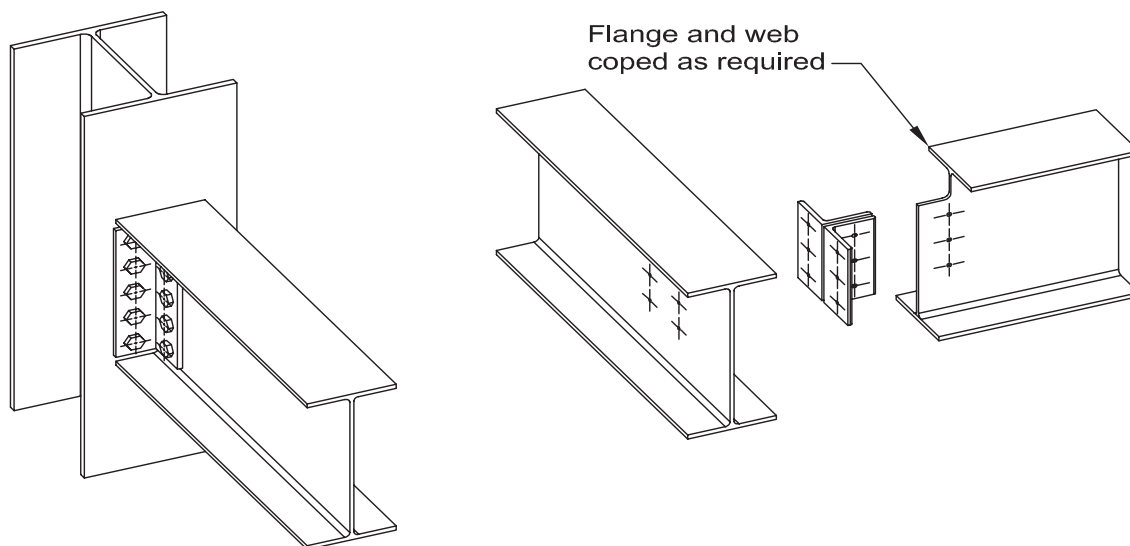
TYPICAL ANGLE CLEAT CONNECTIONS
